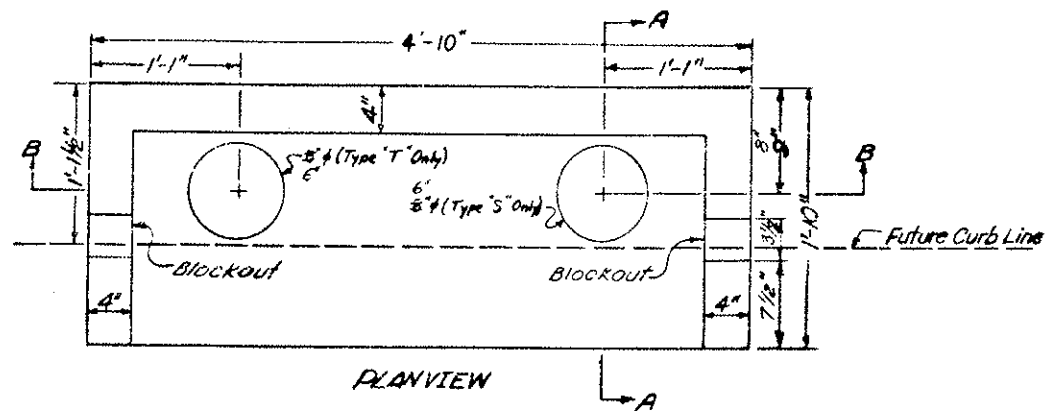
DETAILS OF PRECAST INLET SPECIAL, TYPE "S" & "T"
